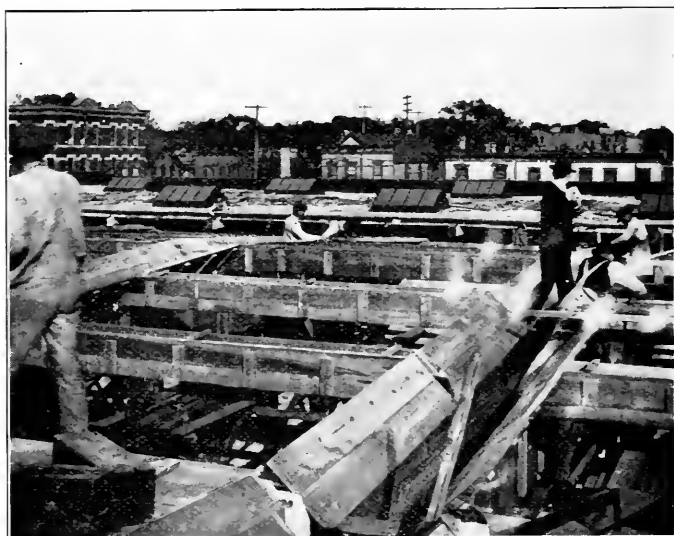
25TH AND LEAVITT STS. CAR HOUSE.
